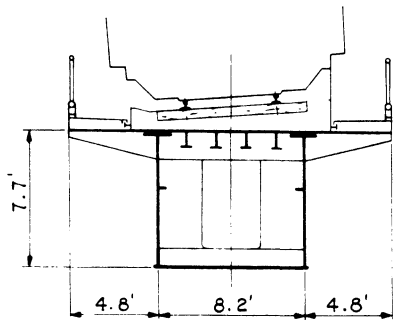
Railroad bridge over Stresemannstrasse, Hamburg, Germany. Spans 132 ft-148 ft. A two span continuous single steel box with stiffened steel deck
